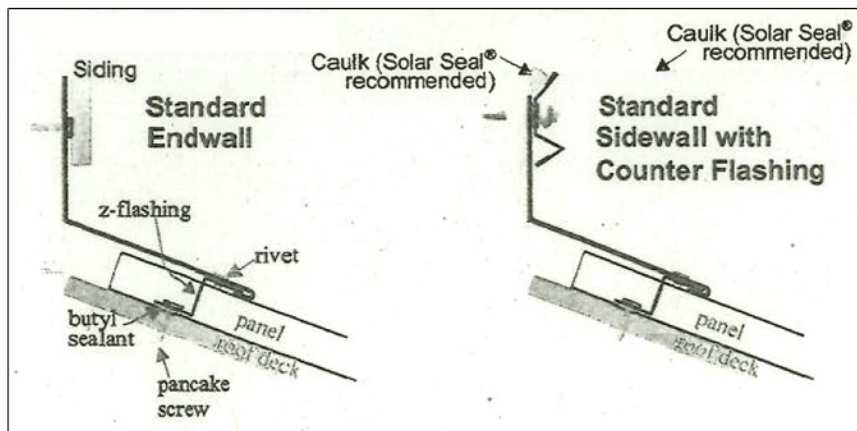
Endwall Flashing is applied where the upper slope of a roof meets a wall.
